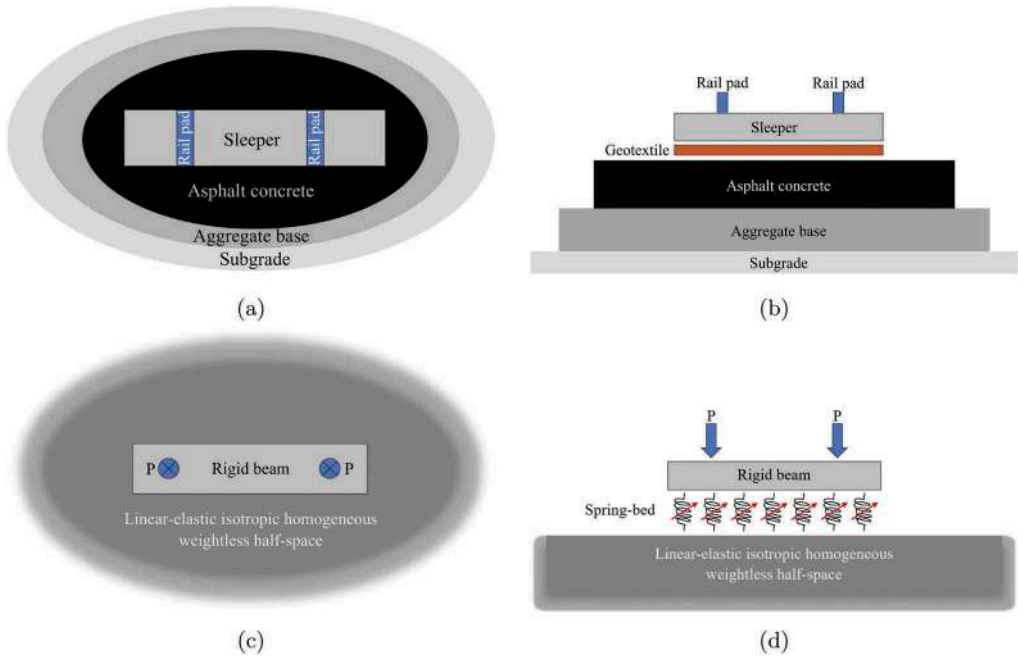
Sleeper-geotextile-pavement contact problem: (a) plan view of a sleeper resting on an asphalt pavement system, (b) cross-sectional view of a sleeper resting on an asphalt pavement system, (c) plan view of model, (d) cross-sectional view of model.
